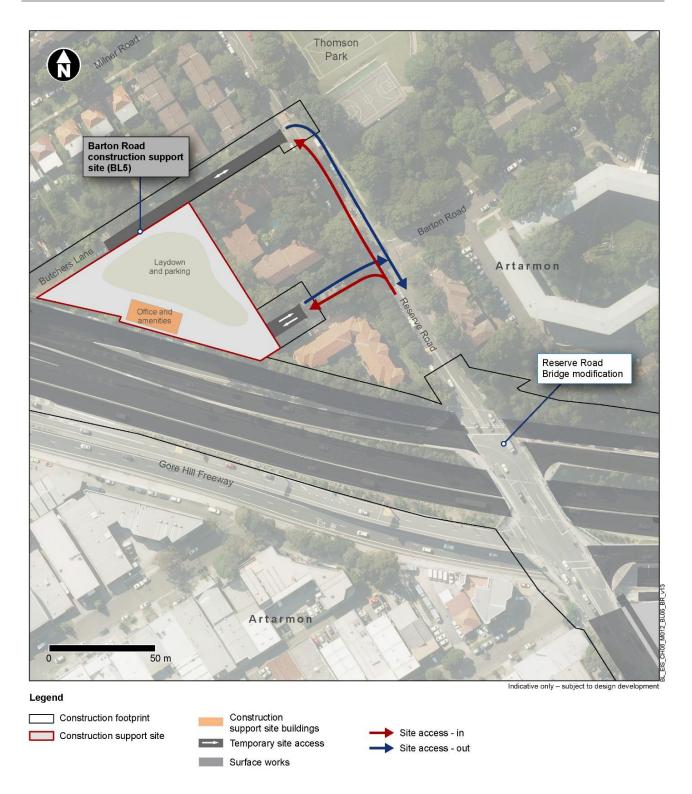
Indicative layout - Barton Road construction support site (BL5)
